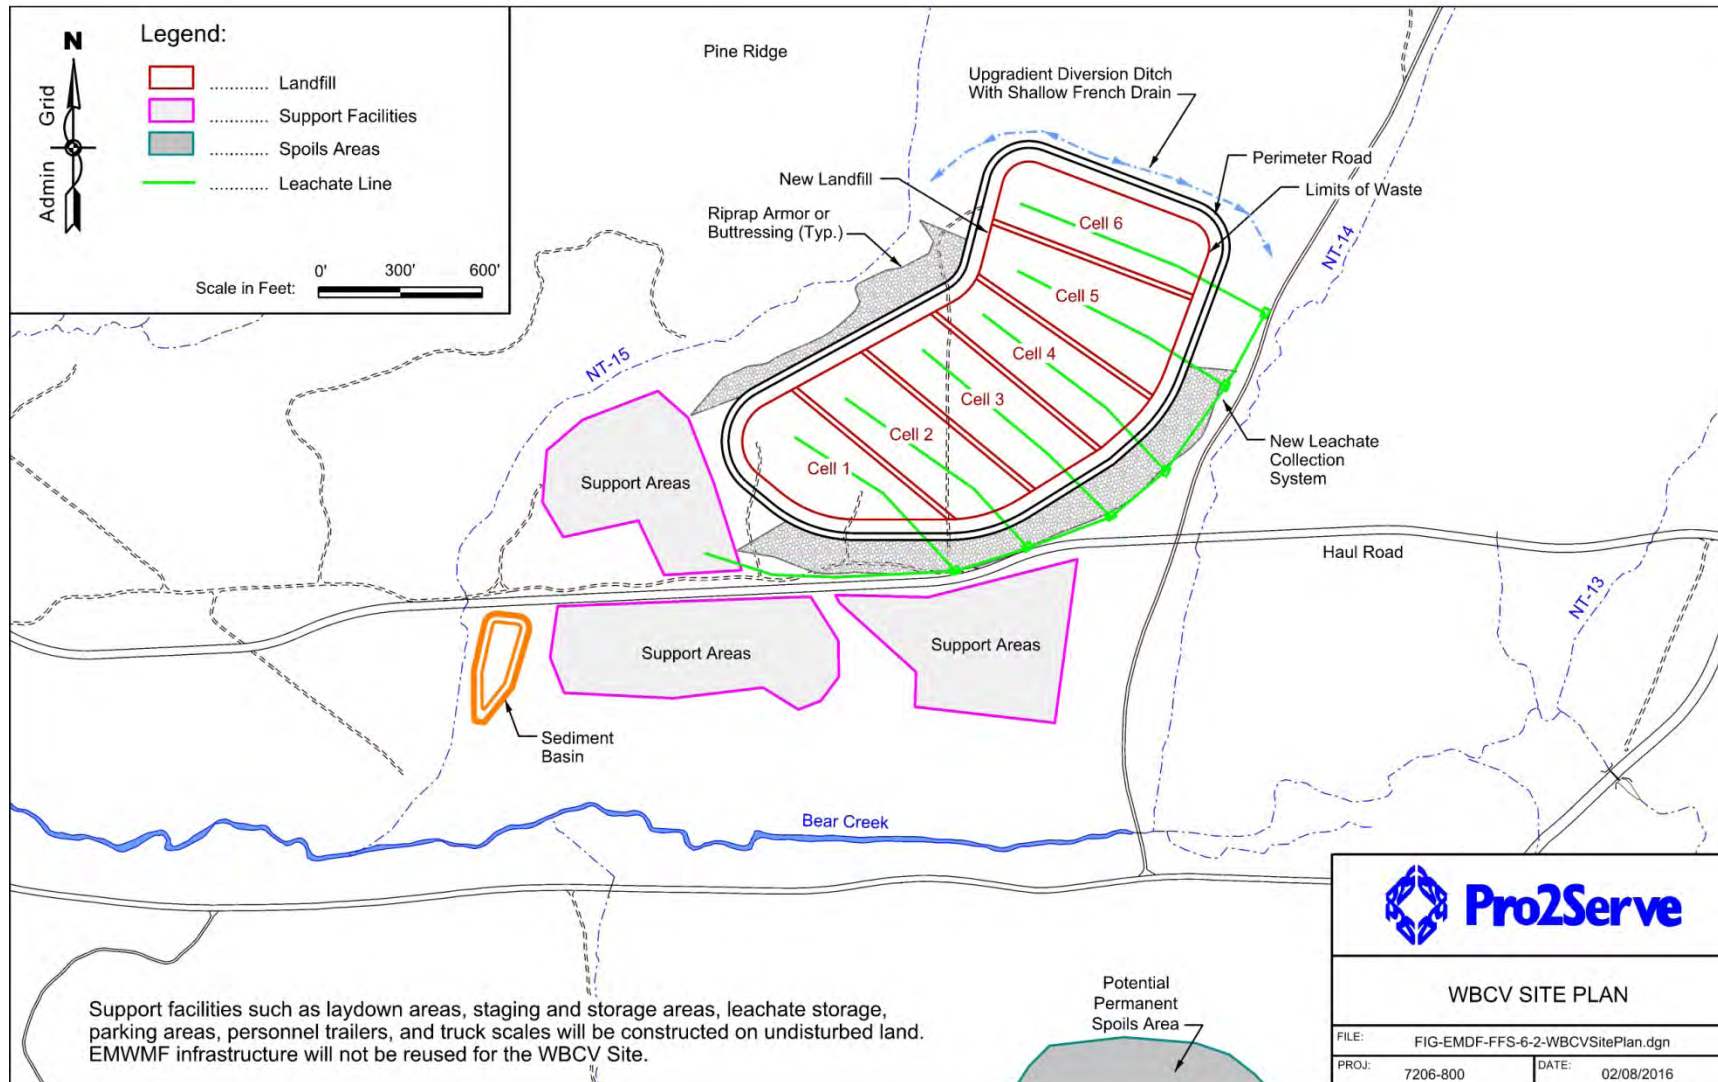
On-site EMDF Conceptual Site Layout Plan at WBCV Site
